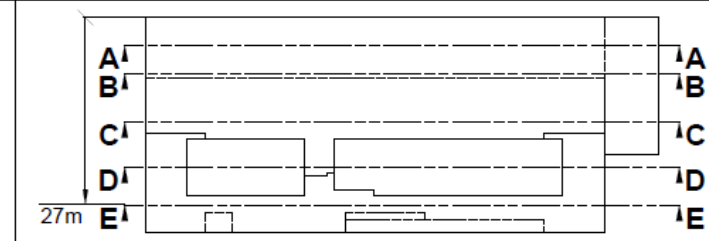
Section view of the tritium plant building at 27 m from the TKB.
